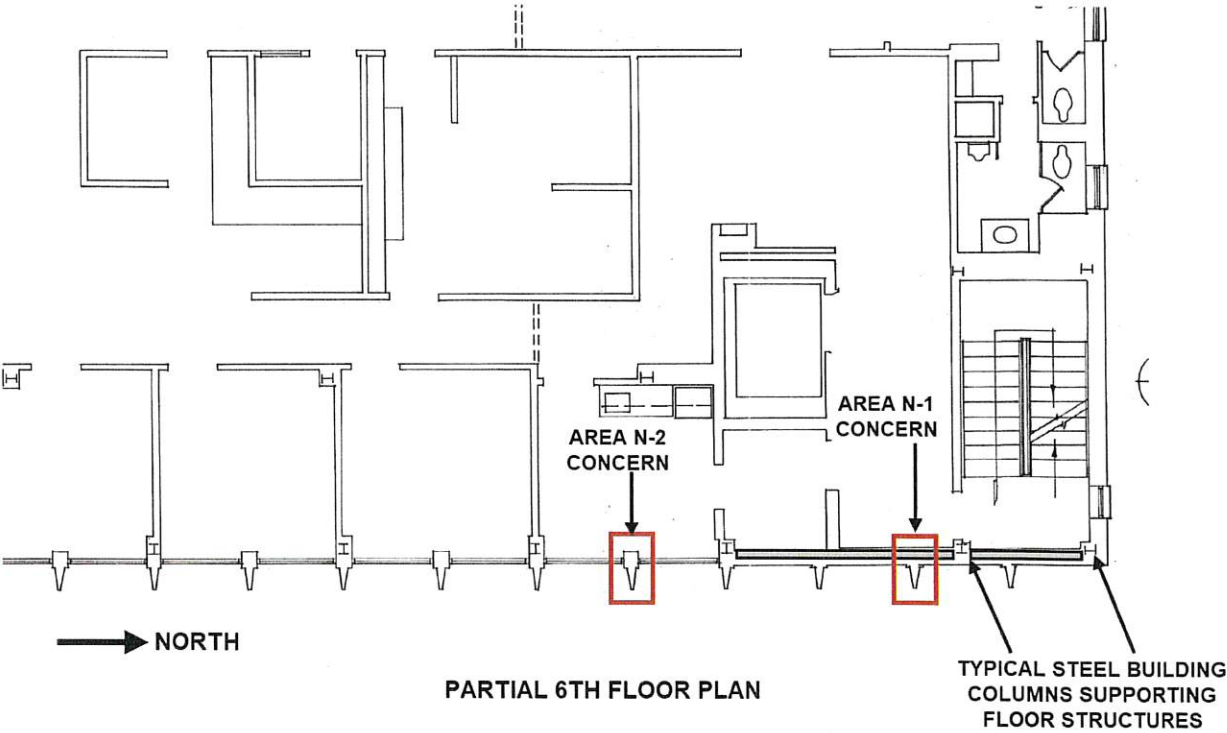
Floor Plan Showing Wall Areas That Have Lost Substantial Lateral Support
